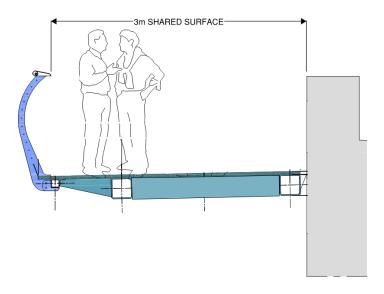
Typical Section through combined Cycle way and Footbridge boardwalk structure
